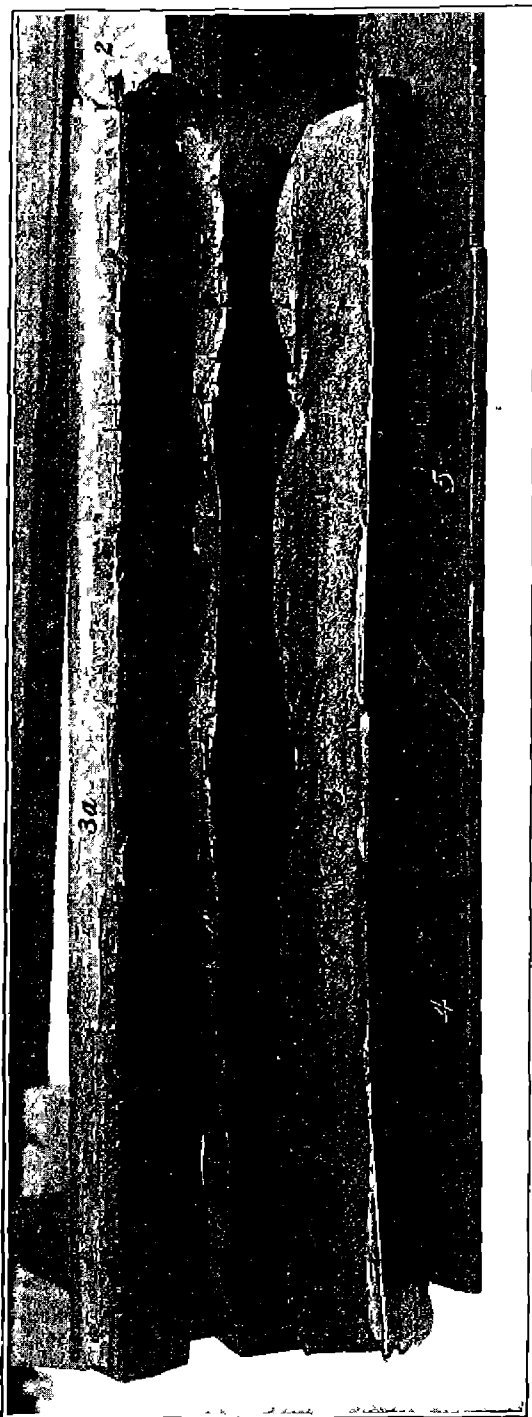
Showing two parts of split head fragments 3 and 3a, believed to have been detached from rail next succeeding the basic fracture, between flanges marked 5 and 5a.
